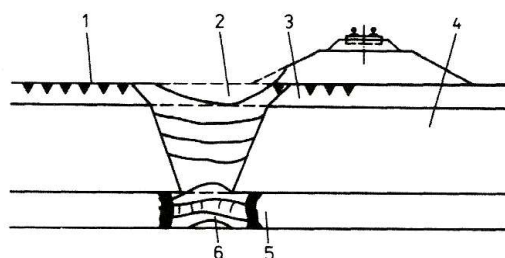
Discontinuous deformation of the terrain around a railway line above mine workings. Land settlement forming a cave-in, resulting from the occurrence of mining damage:
